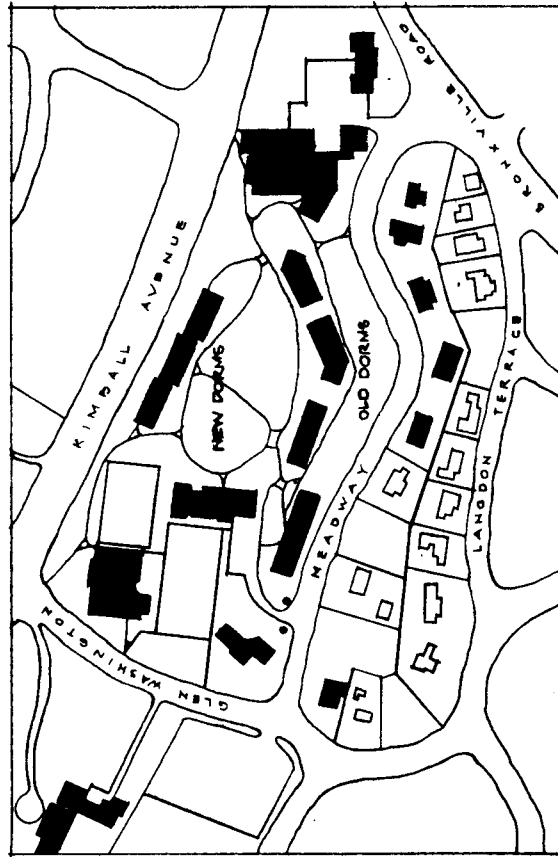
Site Plan of Sarah Lawrence College, Bronxville, New York. Dormitories are situated on either side of the main campus commons. Old dorms: MacCracken, Lawrence, Titsworth, Gilbert. New dorms: Rothschild, Carrison, Taylor. (Courtesy of Sarah Lawrence College)
